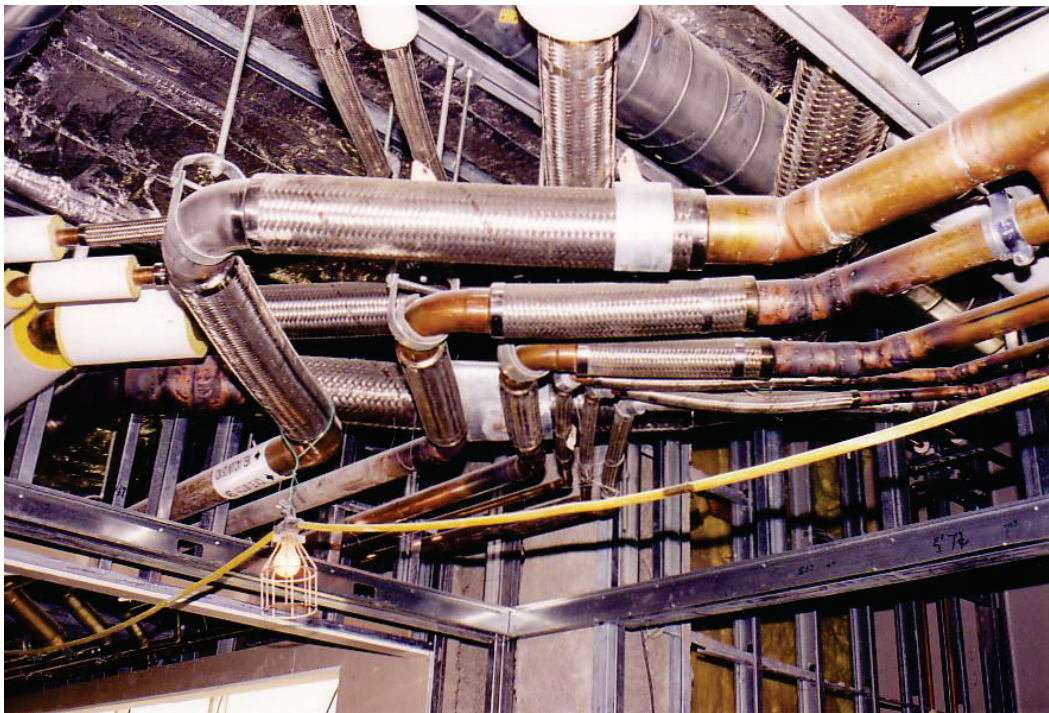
Flexible pipe connections at building separation (Photo courtesy of Mason Industries).
